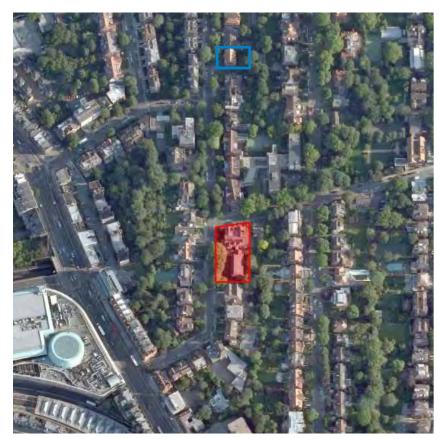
Consented scheme at No. 14 Netherhall Gardens in blue, current application for No. 26 in red
